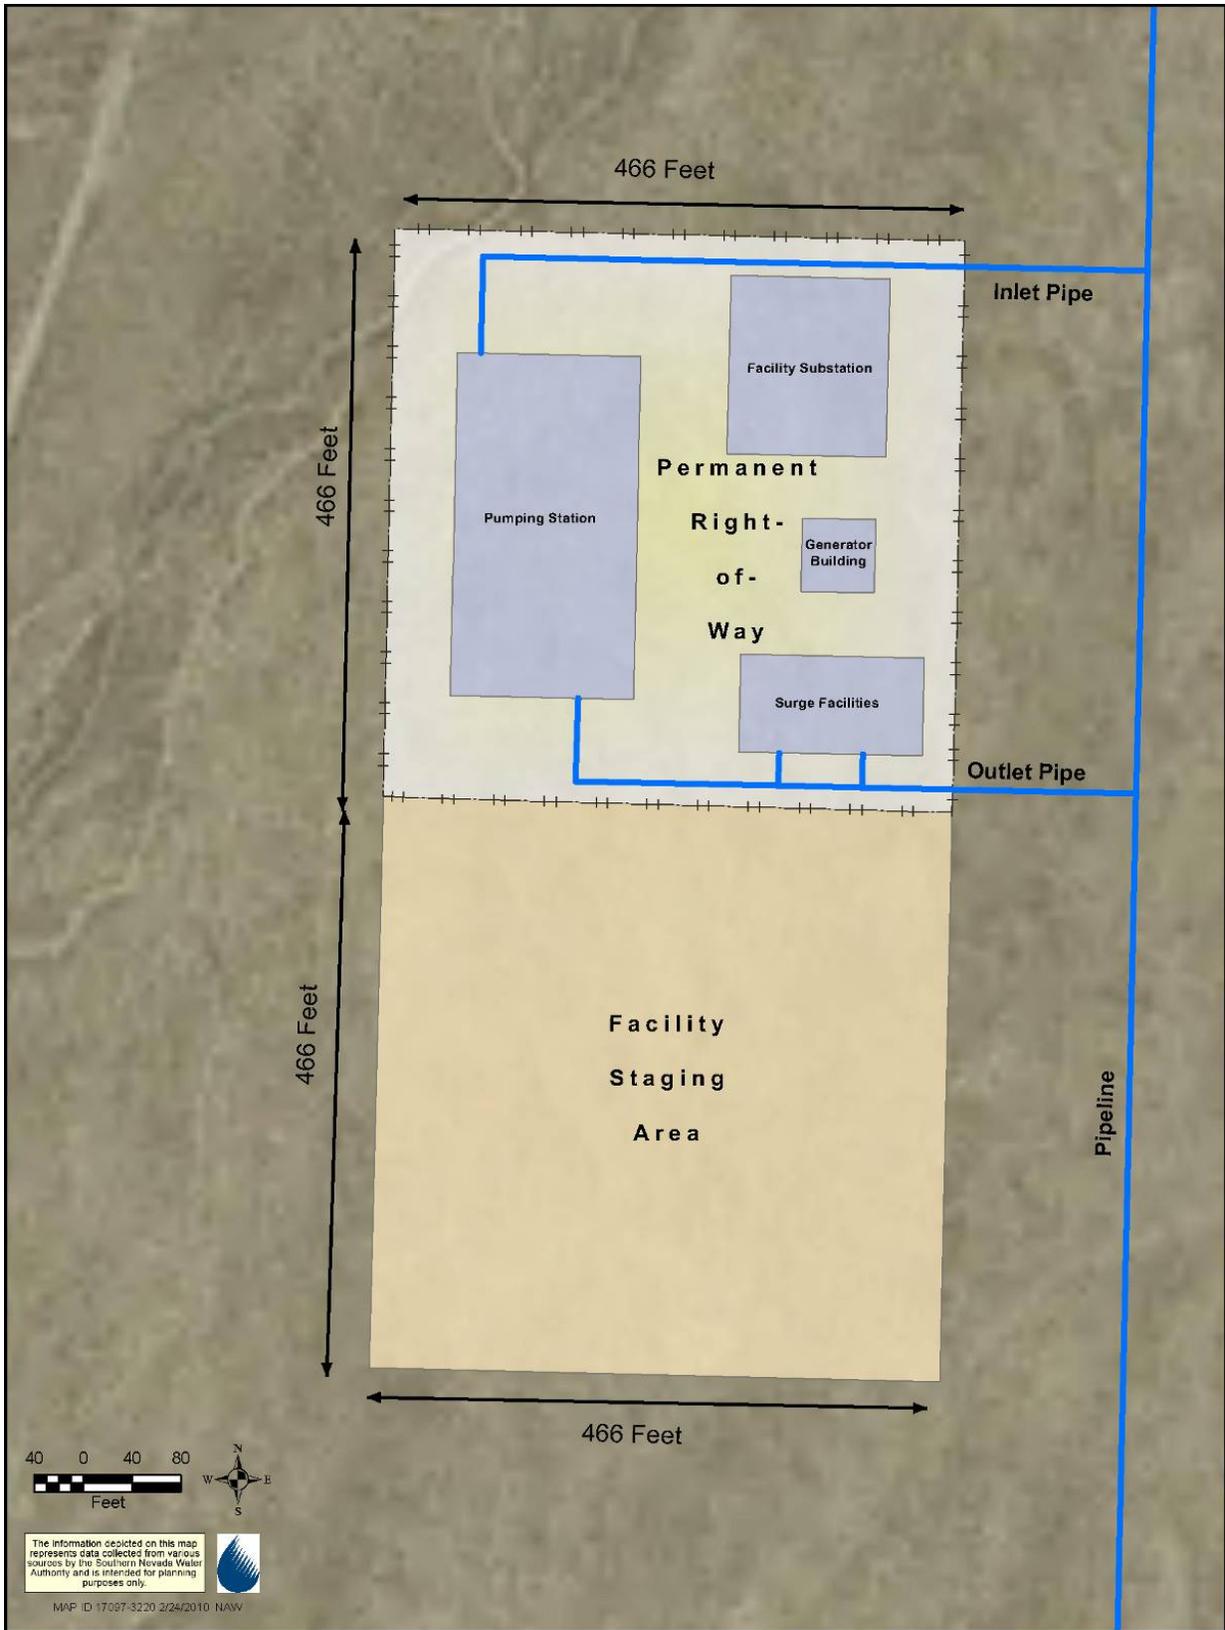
Preliminary Snake Valley North Pumping Station Site Plan
